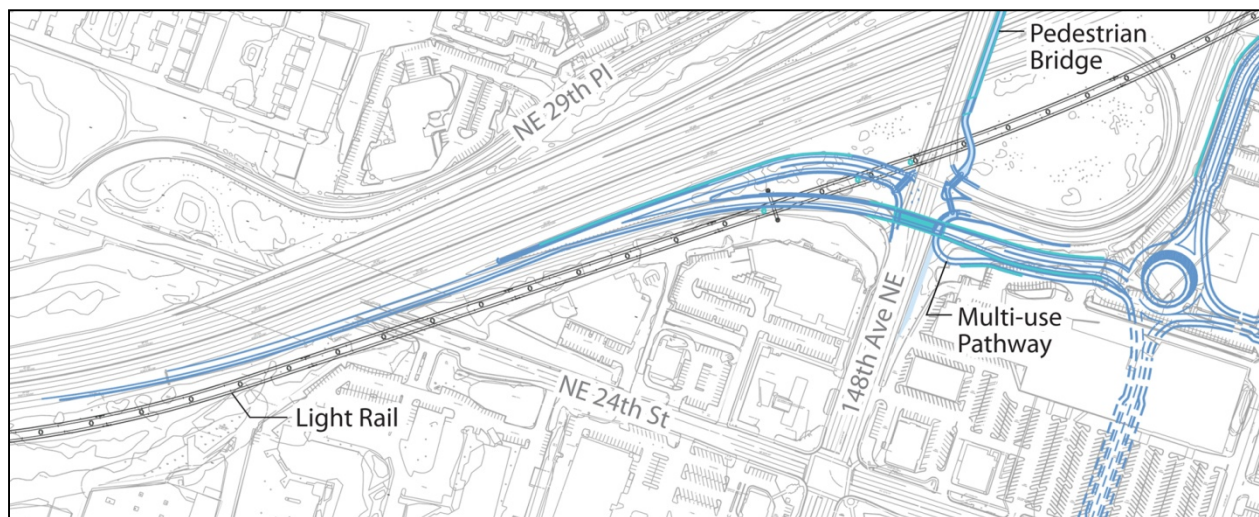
Overlake Access Ramp Connection Alternative A – Tunnel South
